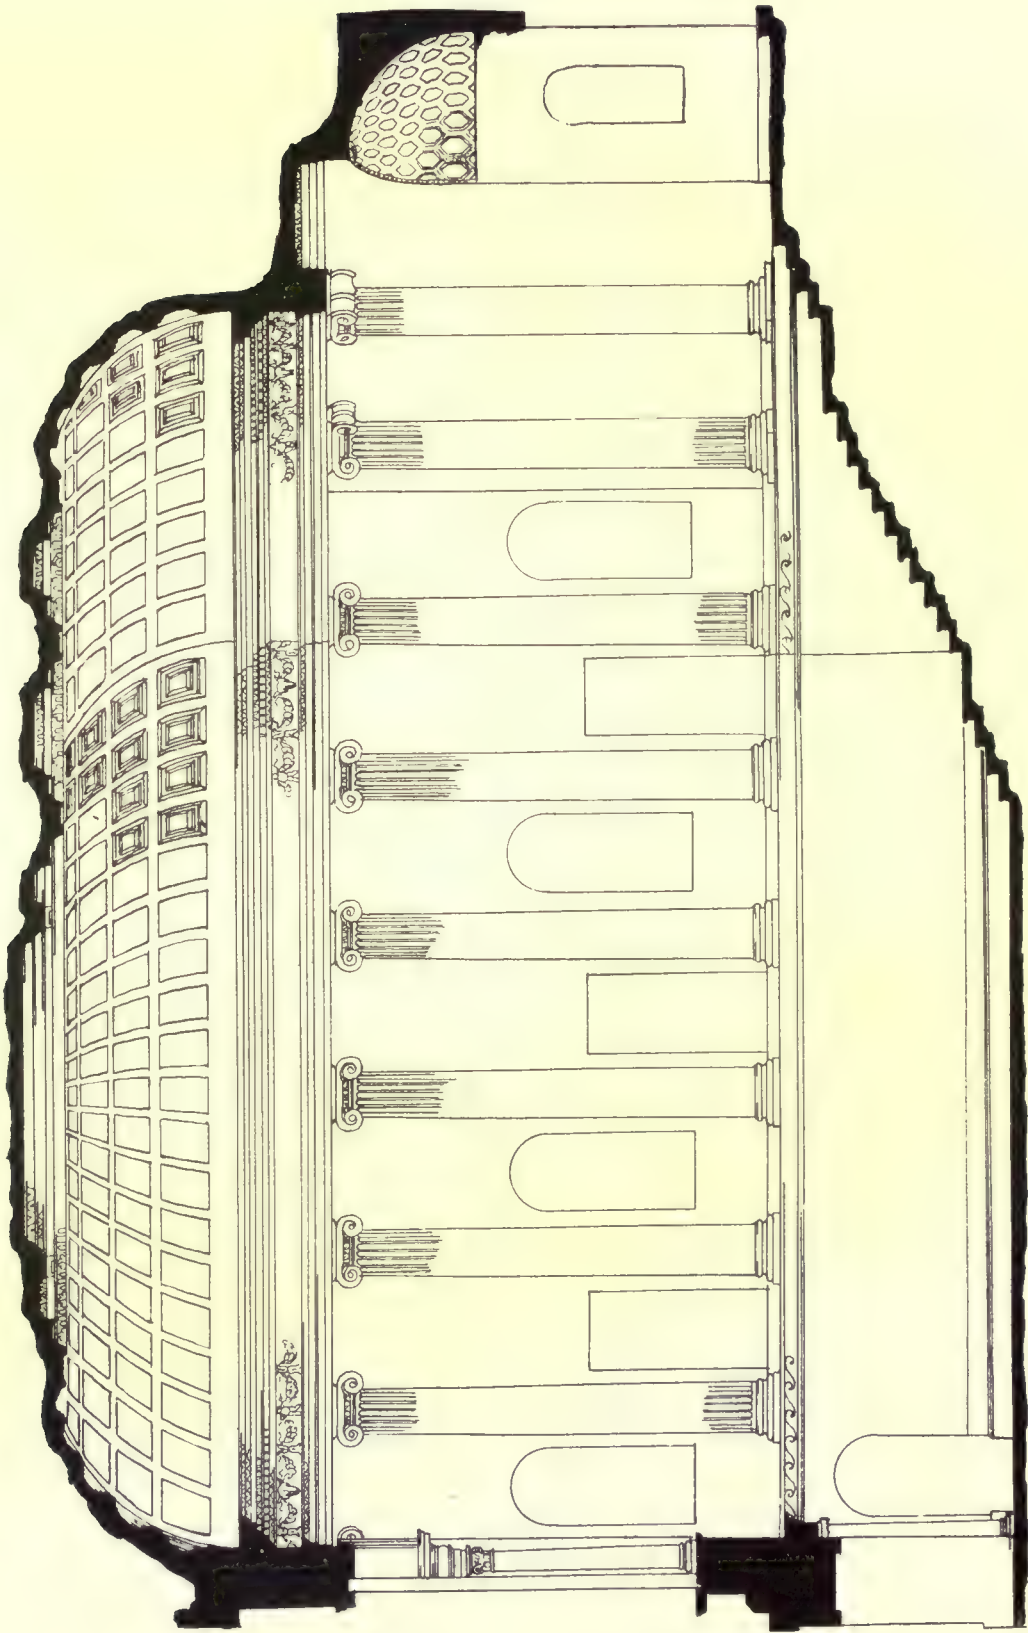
HALL CEILING, HOLKHAM HOUSE.
